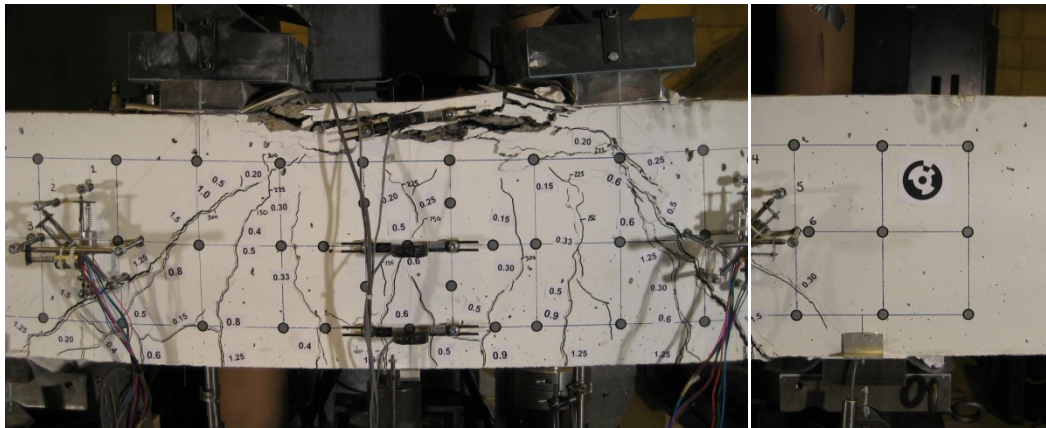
Failure of specimen A1N with flexural crushing between the loading plates.
